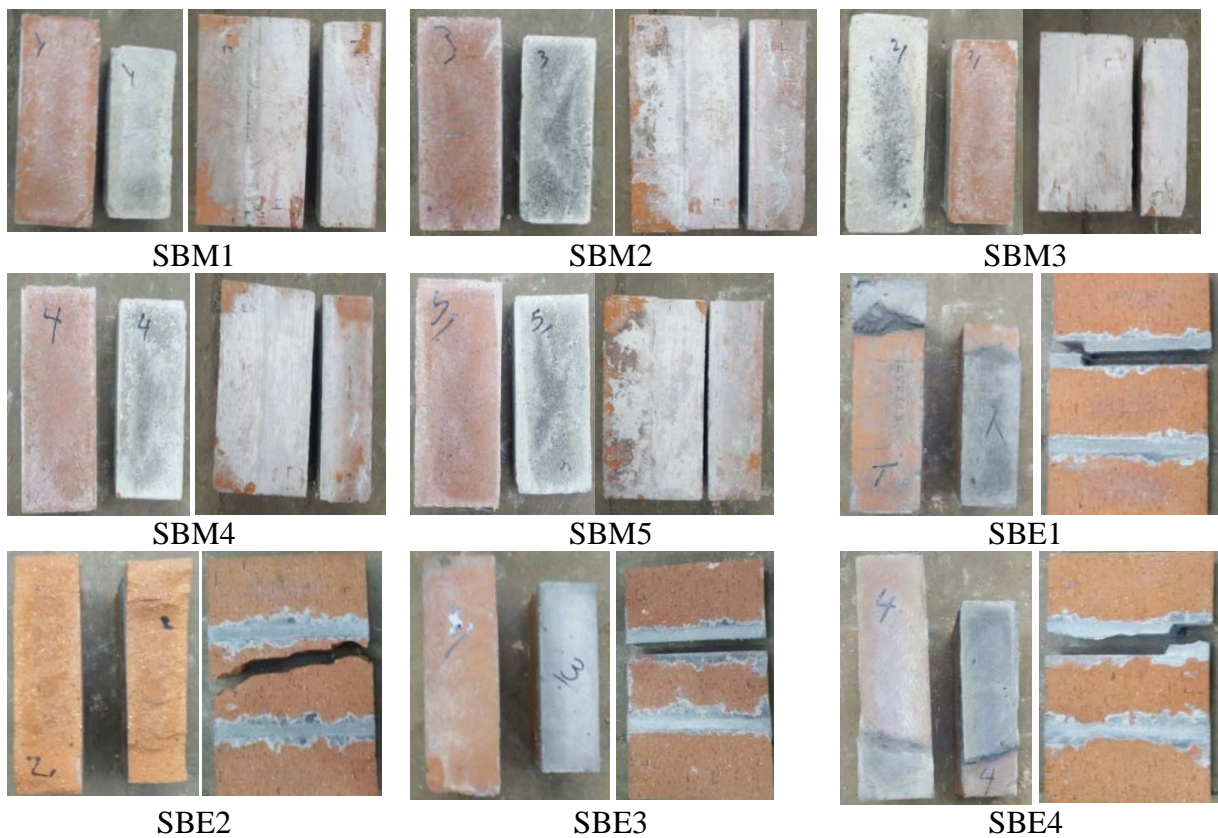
Failure of mortar/ECC joint, with brick/mortar (SBM) samples showing failure at the mortar/brick interface and brick/ECC (SBE) samples showing mixed failure modes.
